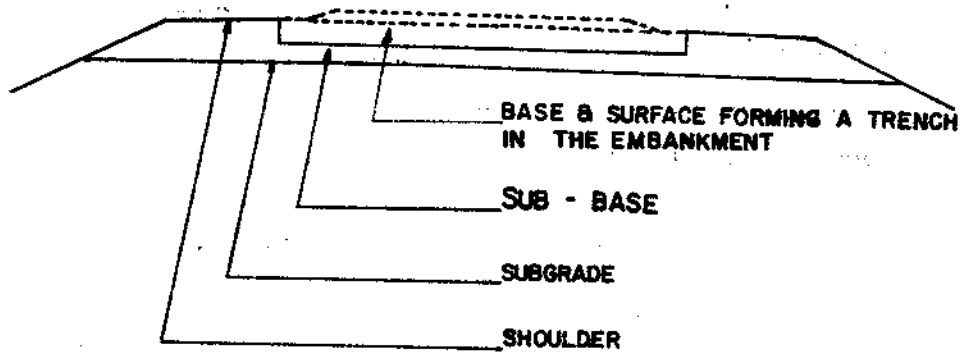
CROSS SECTION OF ROAD PAVEMENT (WITH WIDER EXTENDED BASE)
